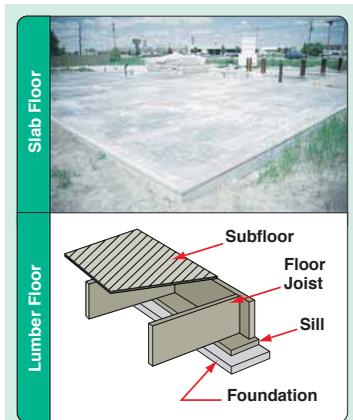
The floors in single-family homes are either concrete slabs or lumber.
